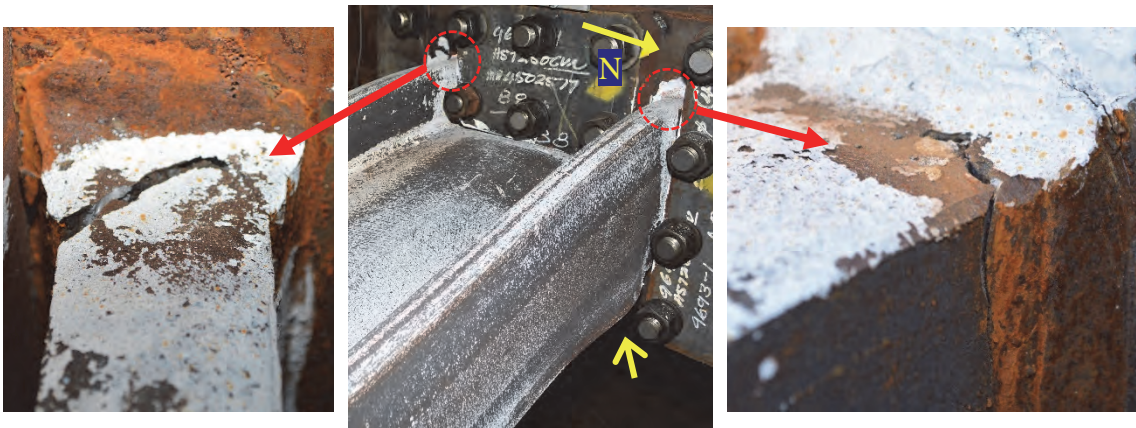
Specimen 15L: Column Flange CJP Weld Fracture and LTB-induced Flange Local Buckling at End of Test (West End)
